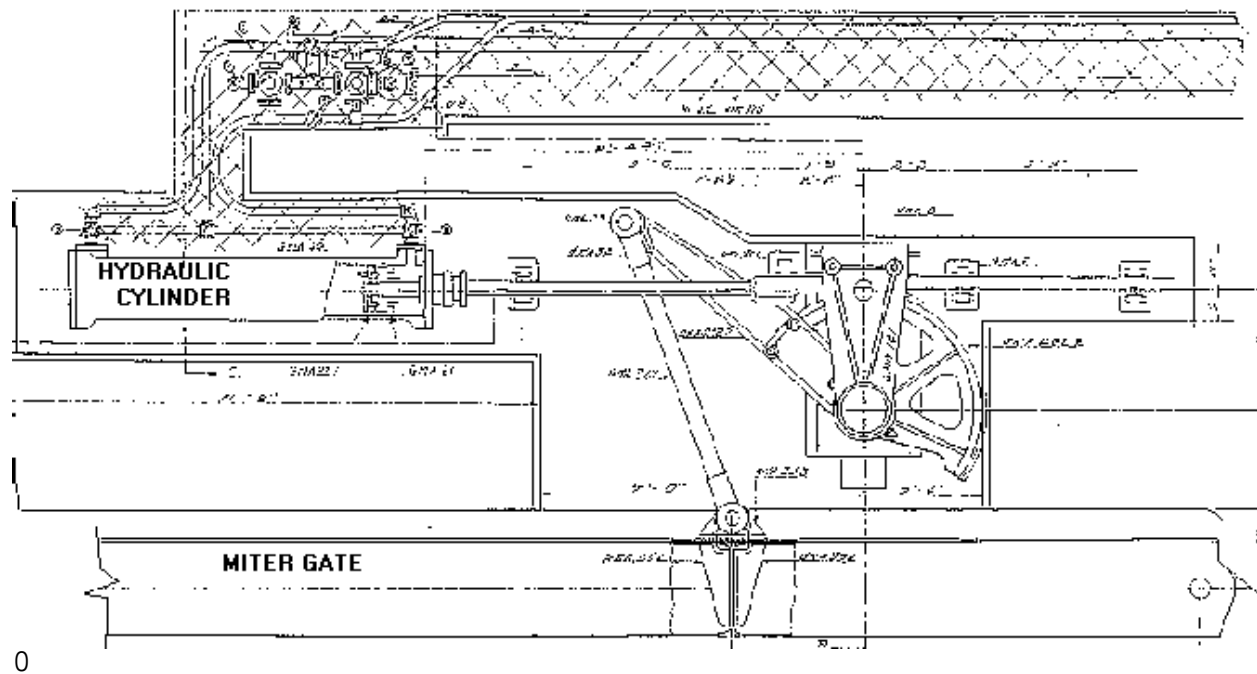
ORIGINAL MITER GATE MACHINERY PLAN VIEW
